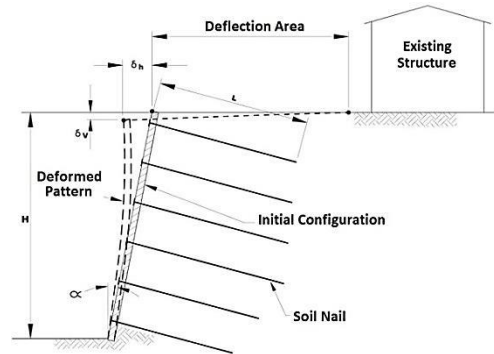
Deformations in soil nailing method of excavation (Sabatini et al. 1999)
